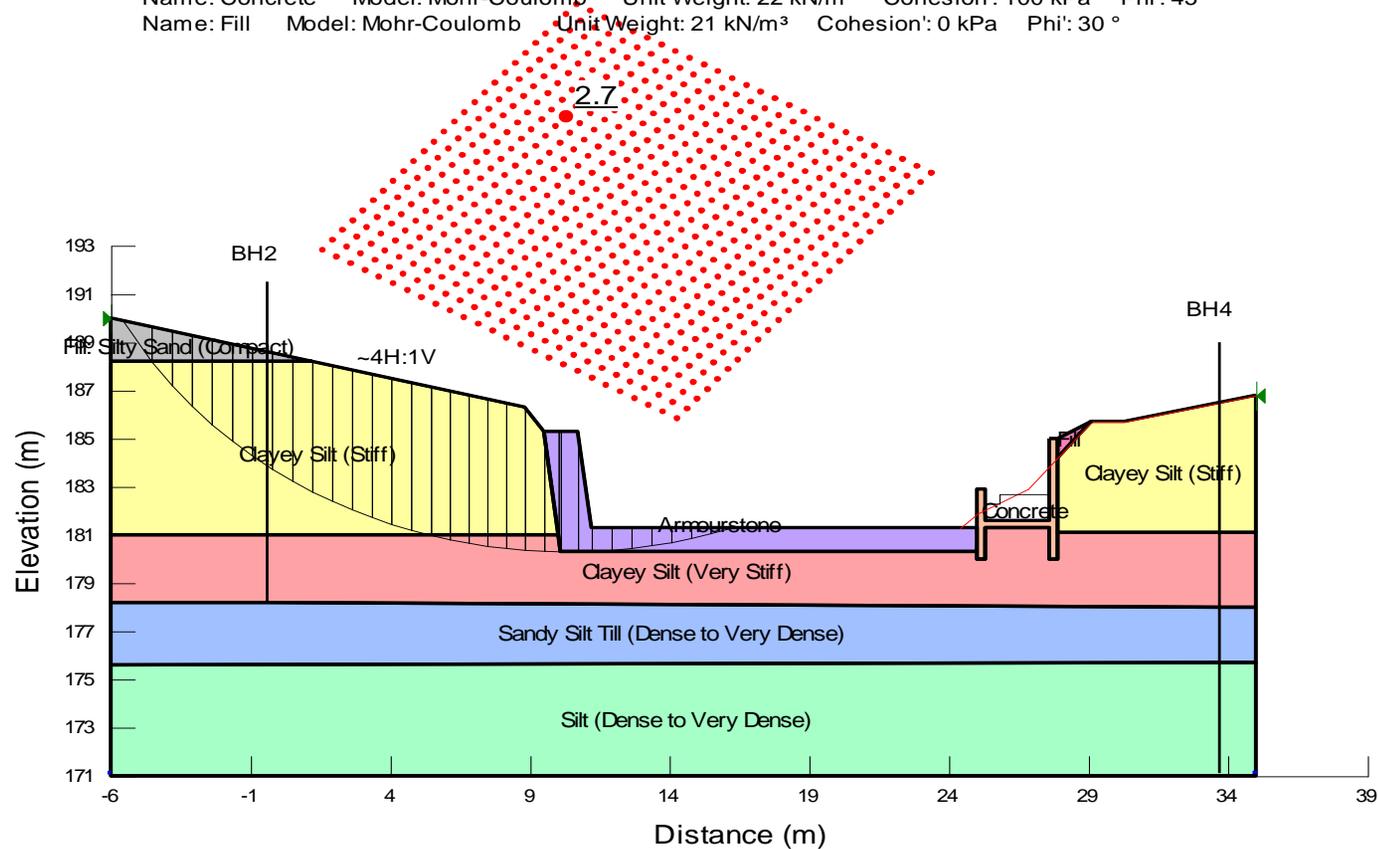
Slope stability analysis for retaining wall – undrained static conditions
